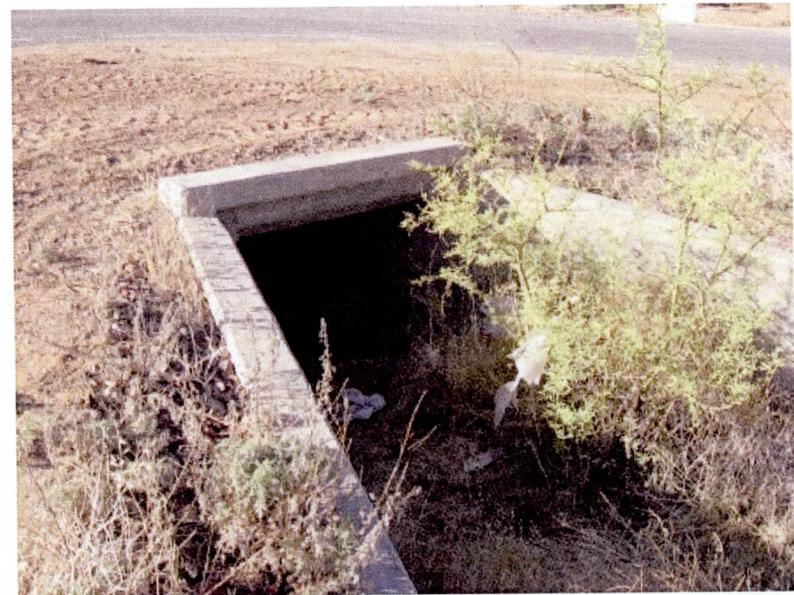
Looking SE at 4'x6' culvert in the NW quadrant of the intersection of Old Happy Valley Road and Citrus Roads crossing SE across Old Happy Valley Road.
